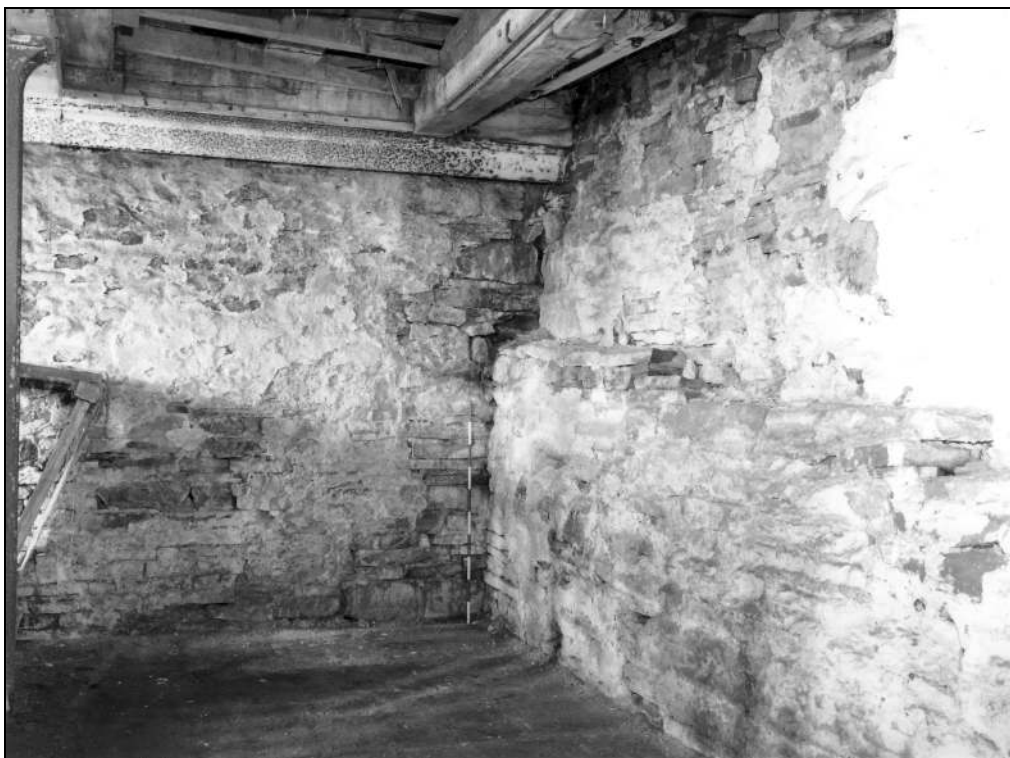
North corner of the mill, below hurst, showing thicker wall to right
